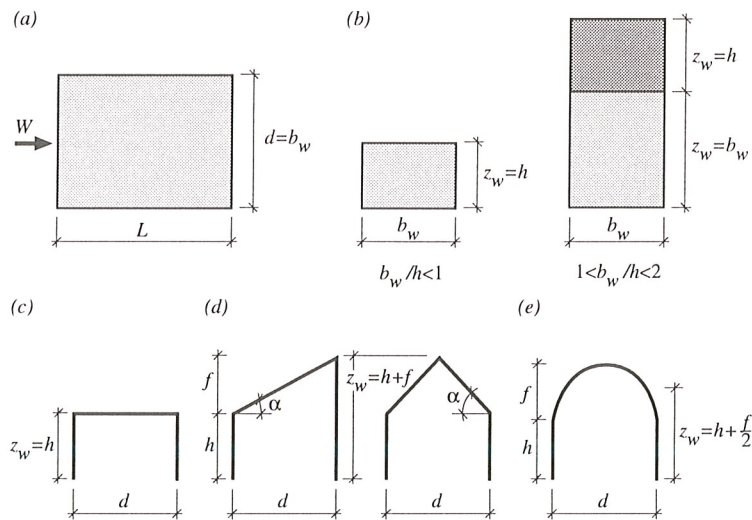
Definition of the reference height z_w for buildings: plan and crosswind dimension (a) walls (b) flat (c) pitched (d) and vaulted (e) roofs.
